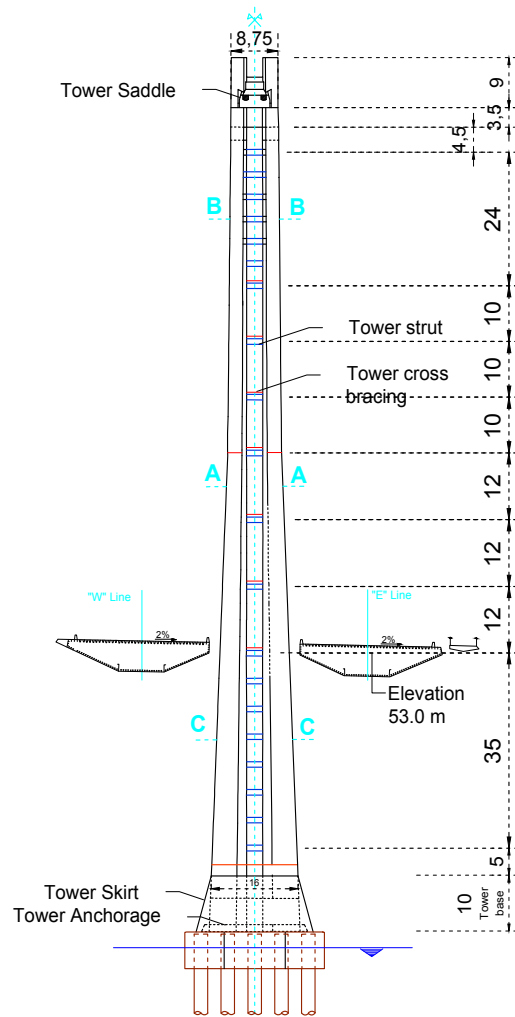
Tower transverse elevation (Ref.: AutoCAD made by the author).
